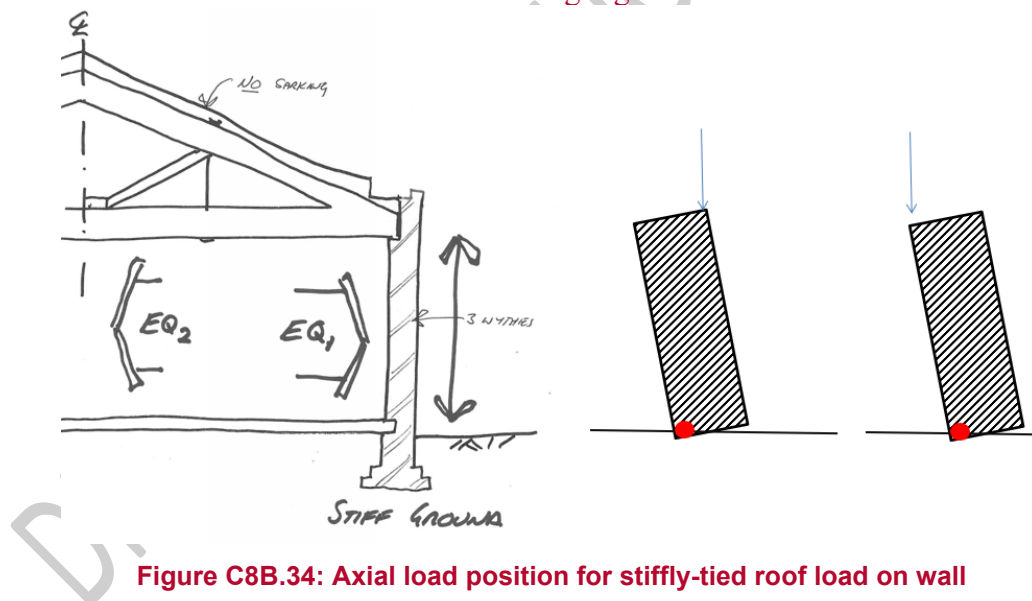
B.34: Axial load position for stiffly-tied roof load on wall
